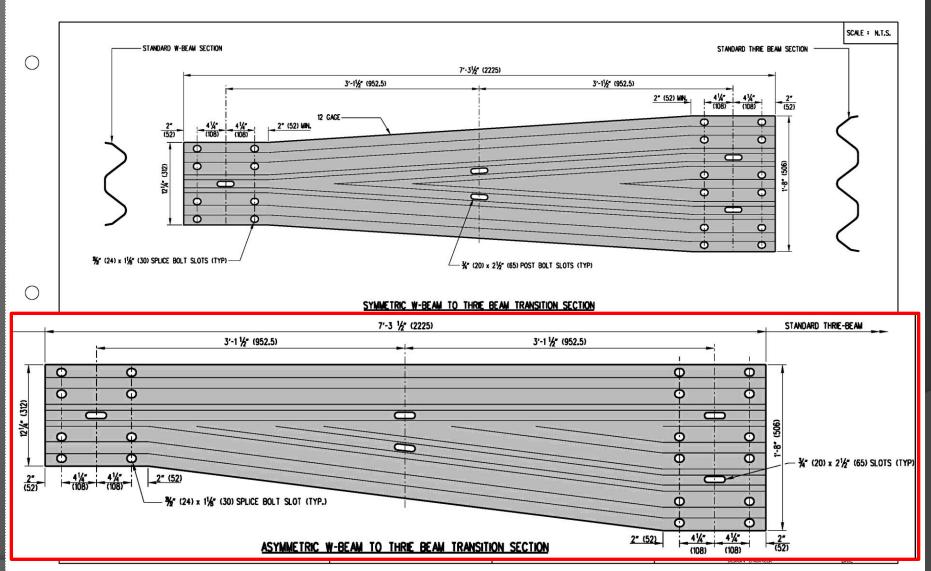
, SHEET 5 OF 5 BRIDGE RAIL RETROFIT, TYPE 4
